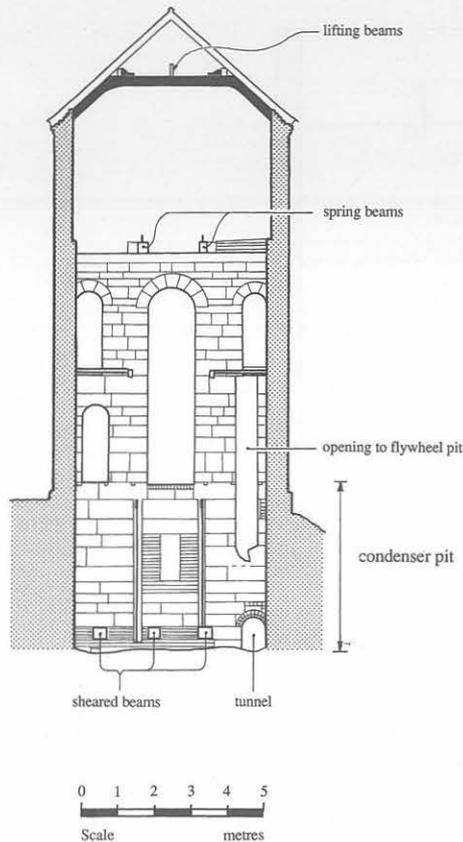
The north elevation of the bob wall, facing the condenser pit, in the south engine house. The sheared cast-iron beams supported the condensing cylinder and pump. The tunnel continues beneath the flywheel pit, providing access to its holding-down bolts.
